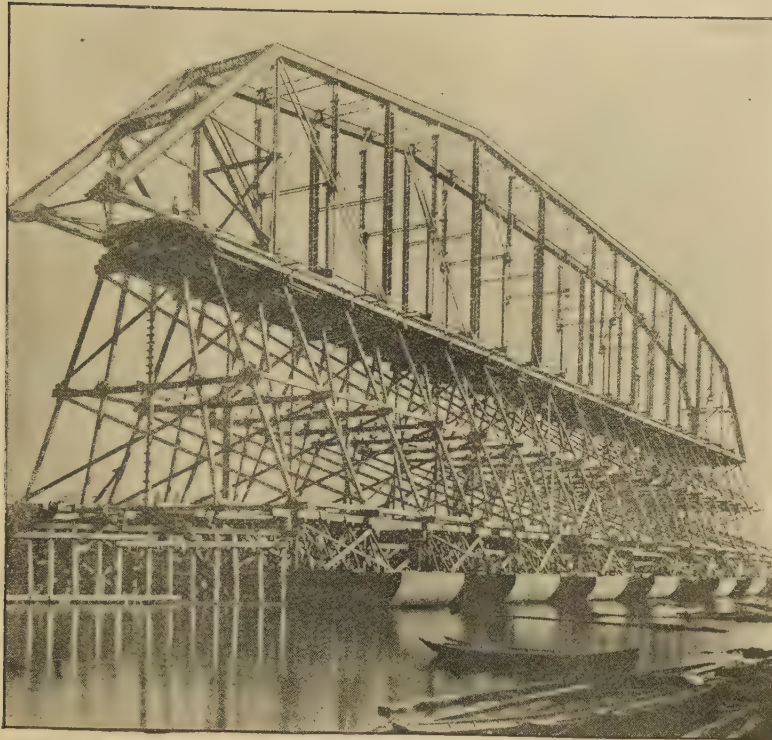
OHIO CONNECTING RAILWAY BRIDGE.
